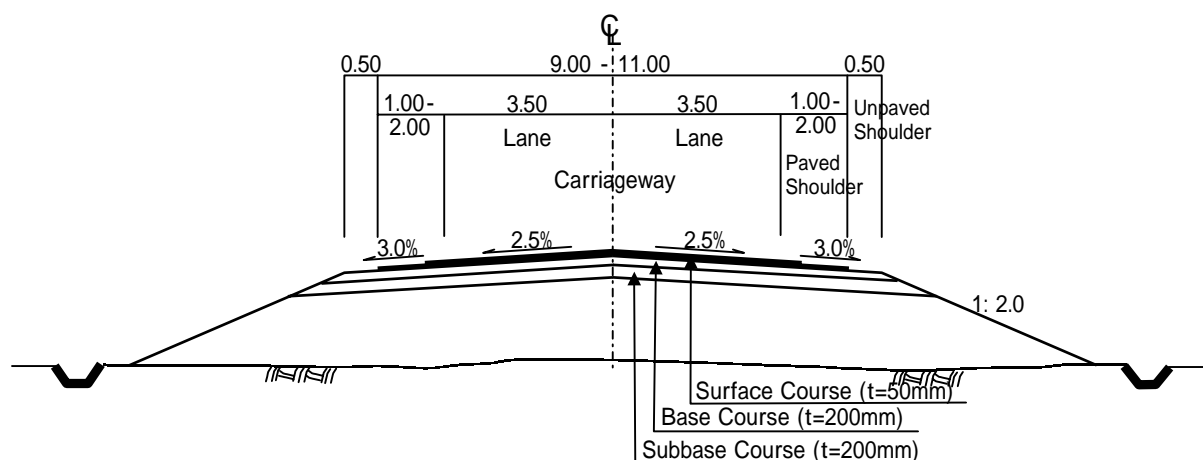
Typical Cross Section for Alternative (i) (L = 8.40km)
